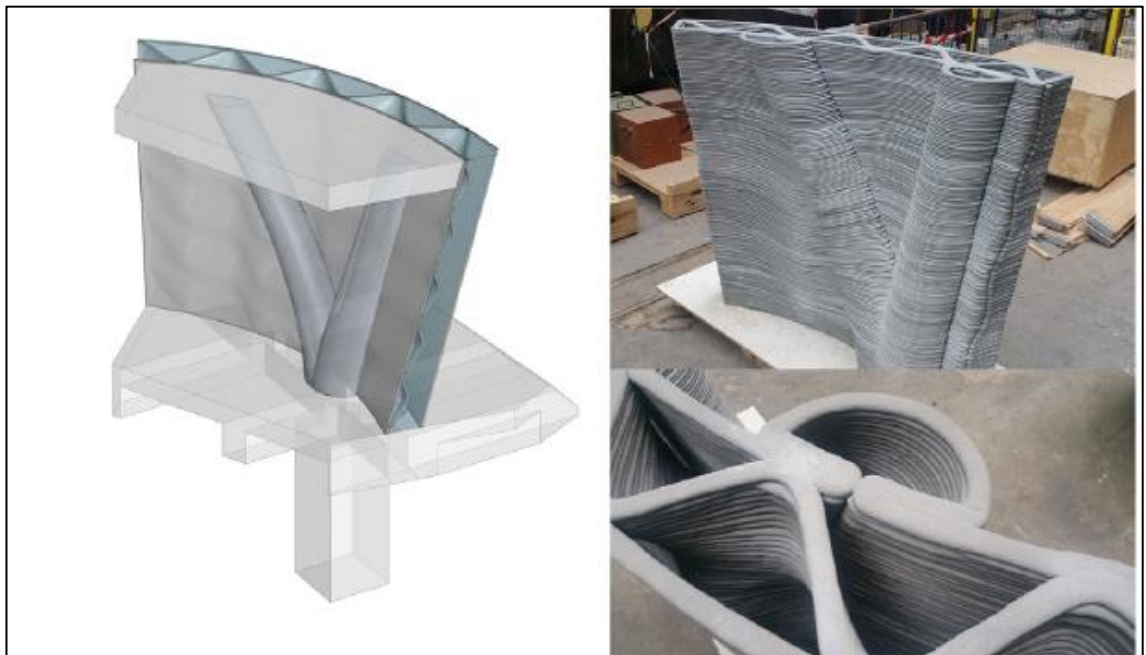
Wall element with infill designed to enhance thermal insulation (Gosselin et al. 2016)
